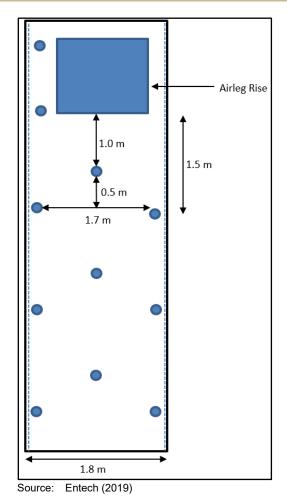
Plan view of example drill and blast pattern (average stope width of 1.7 m). The blue dotted line shows the stope outline.
